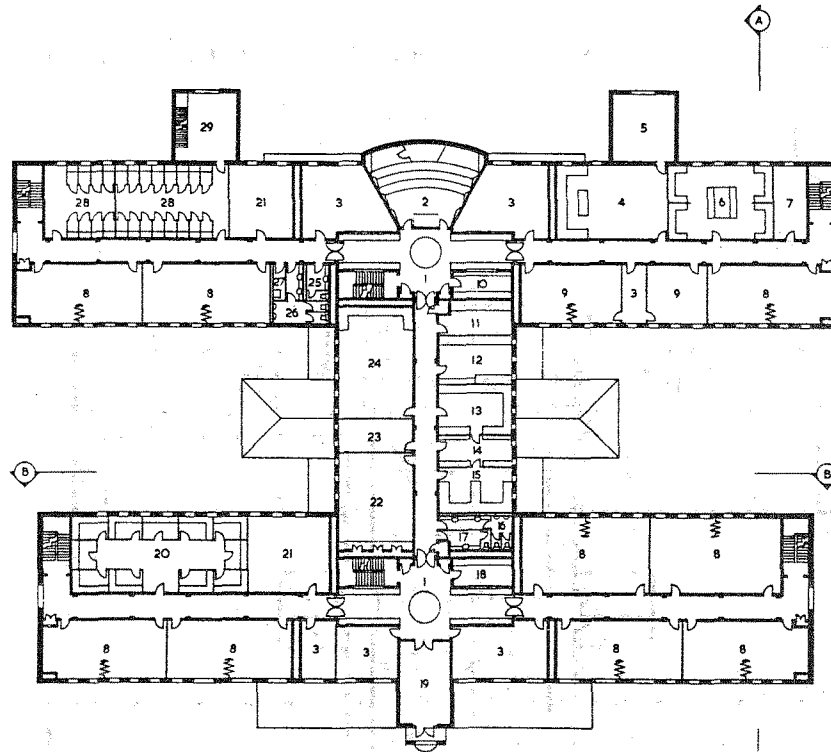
COMMUNICATIONS SCHOOL - GROUND FLOOR PLAN
